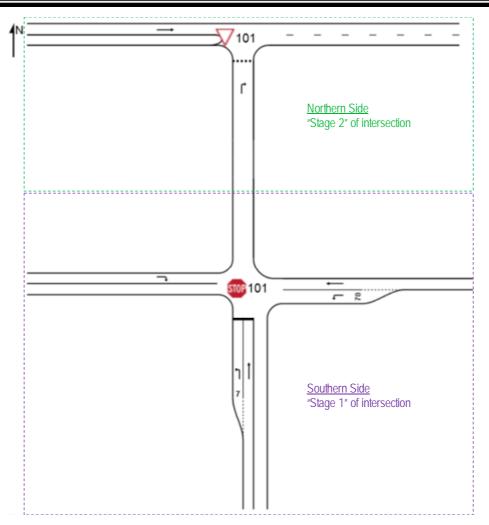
Cudgen Road / Kingscliff TAFE Access SIDRA Intersection Layout
